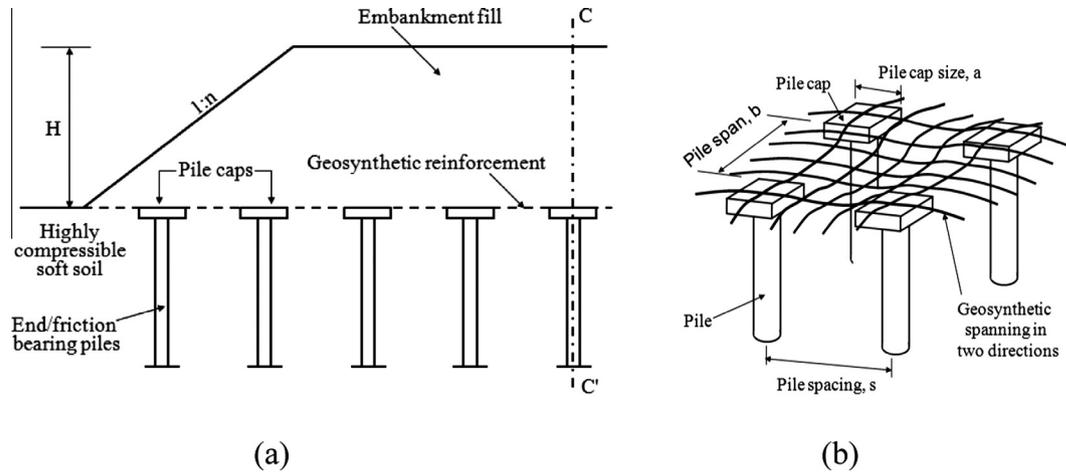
(a) A section of a piled embankment and (b) the general layout of piles (caps) and reinforcements (after Kempton et al. [20]).
